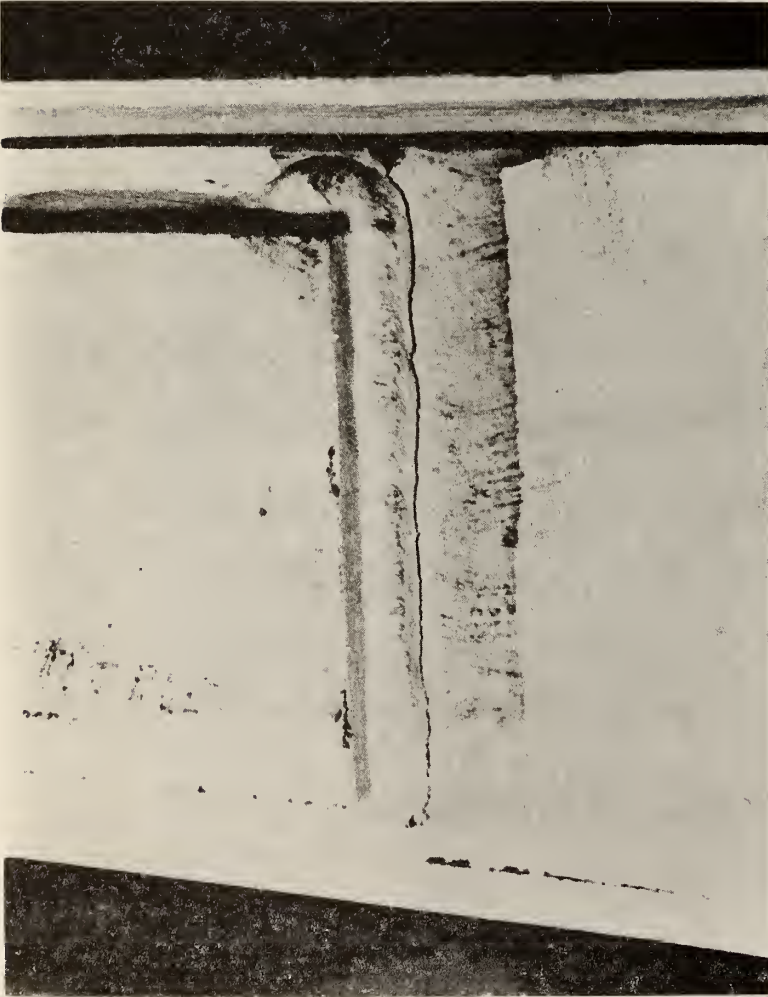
Crack formation at toe of transverse fillet weld connecting cover plate to beam flange.
